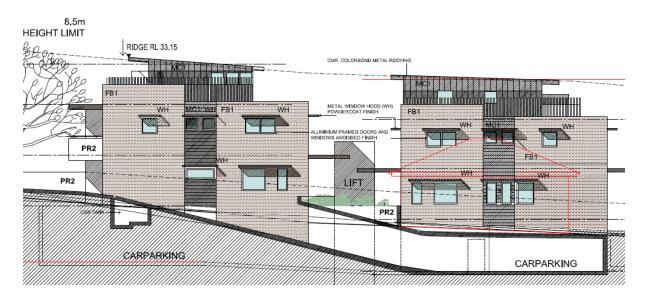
Western elevation plan extract showing minor 255mm breaches of the front and rear pavilion roof forms
